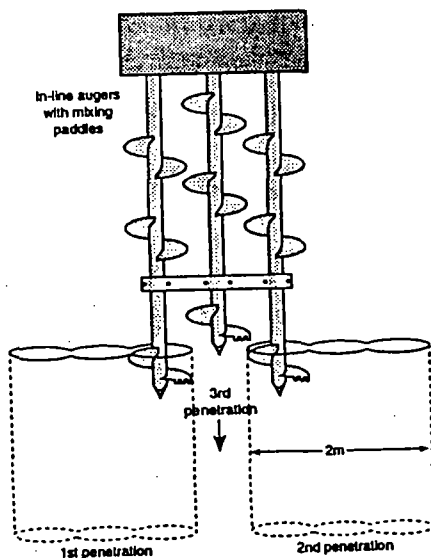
Construction of an In Situ Mixed Cutoff Wall
